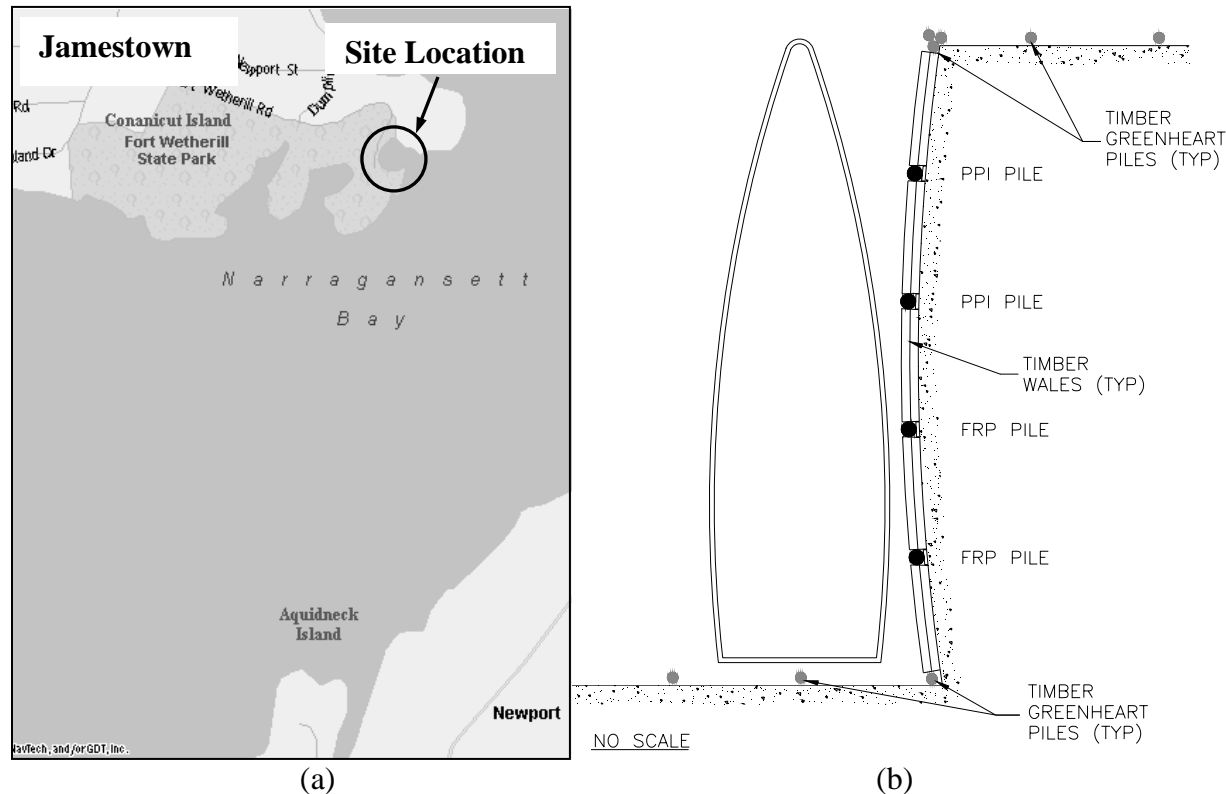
a.) Location of test site and b.) layout of test piles.
